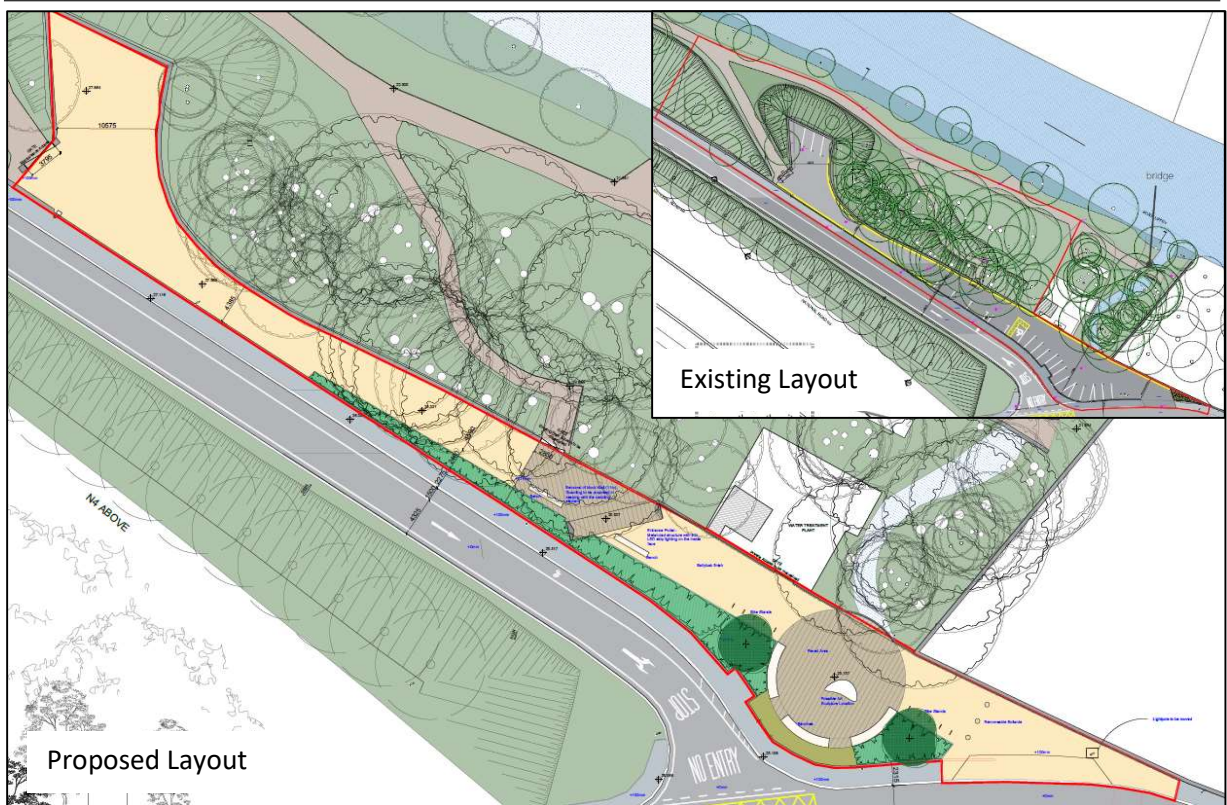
Demesne Entrance - Existing and Proposed Layout
